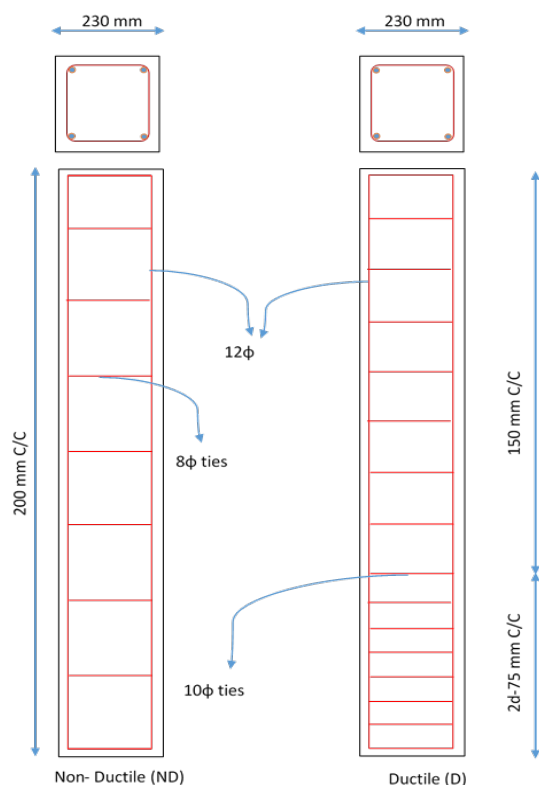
Schematic of the cross-section and reinforcement detailing of the columns
